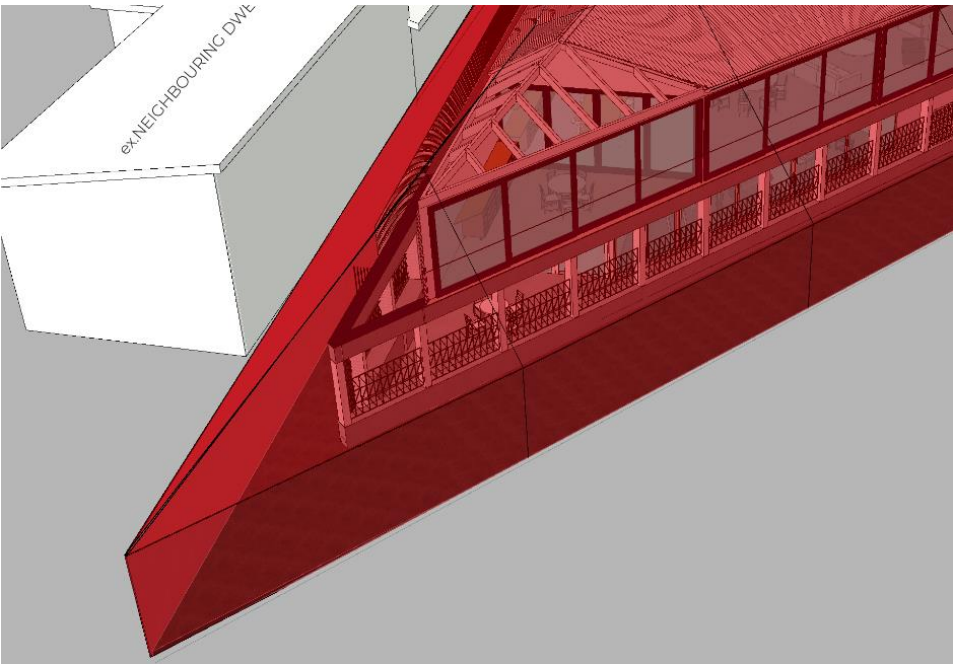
Extract from the proposal plans as prepared by Starbox showing the building envelope diagram on the sites northern end which provides a view of the nominated area of private open space and the first floor balcony space.
